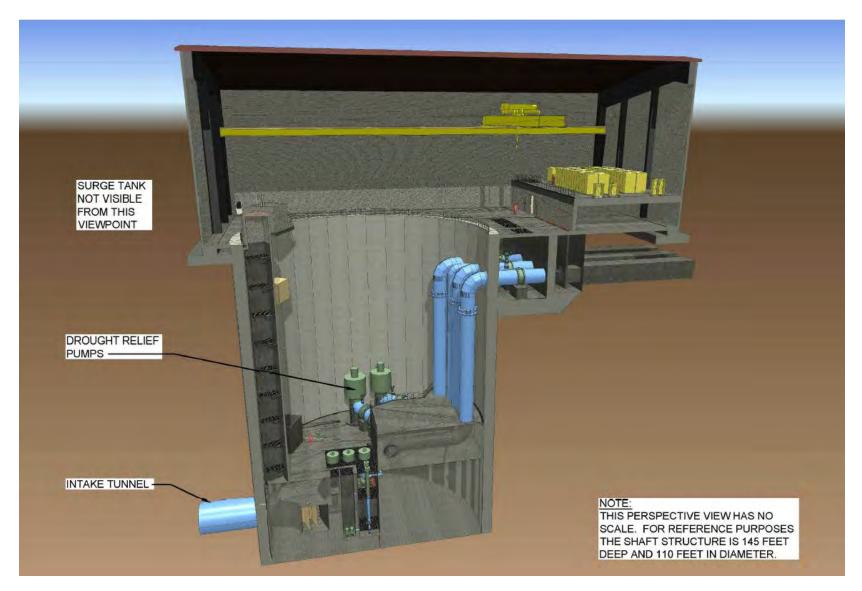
Three-dimensional Cross Section View of South Pumping Plant (looking east)
